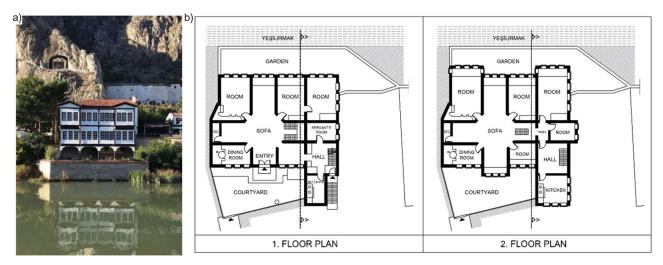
Studied building (a) (Author archive) and floor plans (b) (Ministry of Culture and Tourism, 2021) (Edited by authors)
